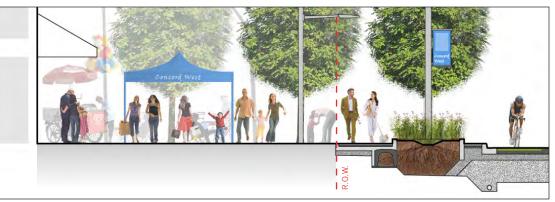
Stormwater buffer section (see Section 3.3.2 for further detail).
